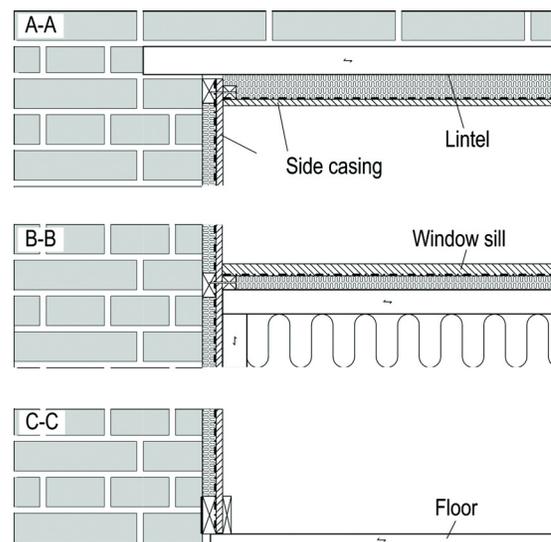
Sectional view of sections A-A, B-B, and C-C (see Figure 10).
